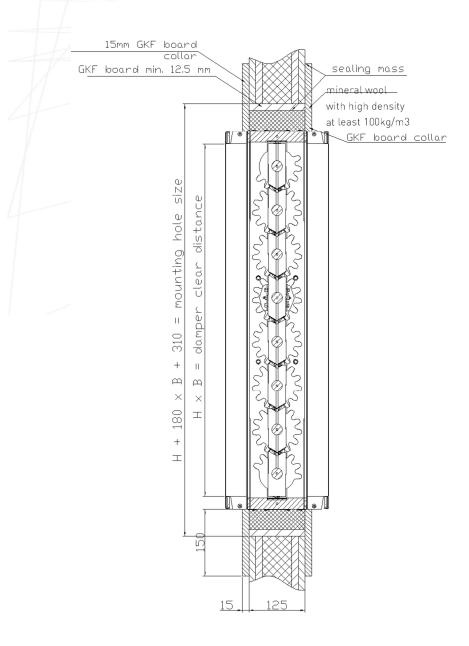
Installation method of fire dampers WKP-P in flexible wall with 125 mm thick
